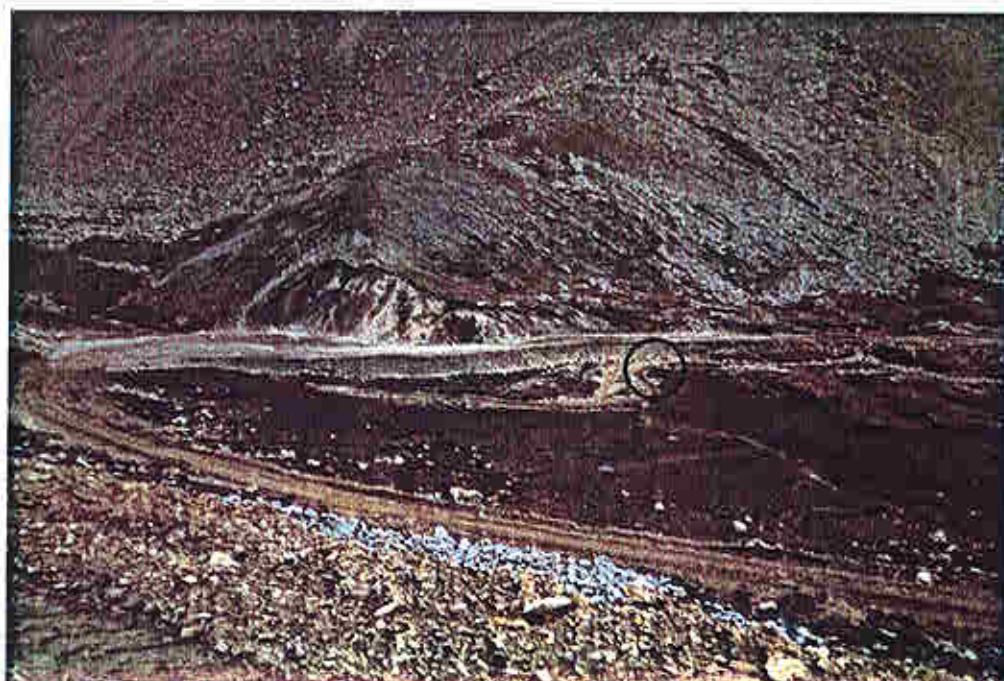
Looking south, Mile 9.9 after road construction (26/08/80). Note point of reference.
